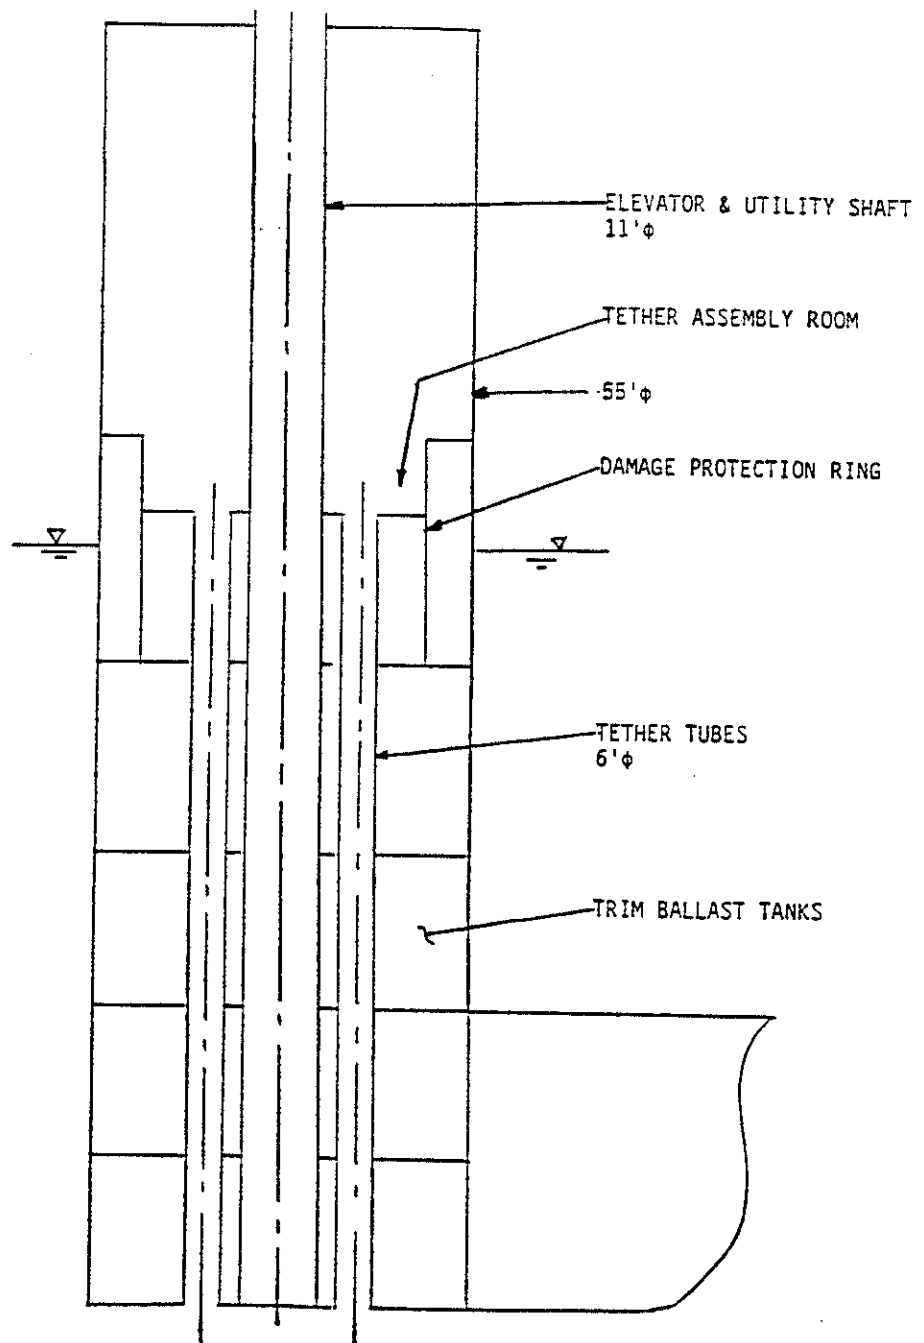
TLP COLUMN STRUCTURAL ARRANGEMENT
